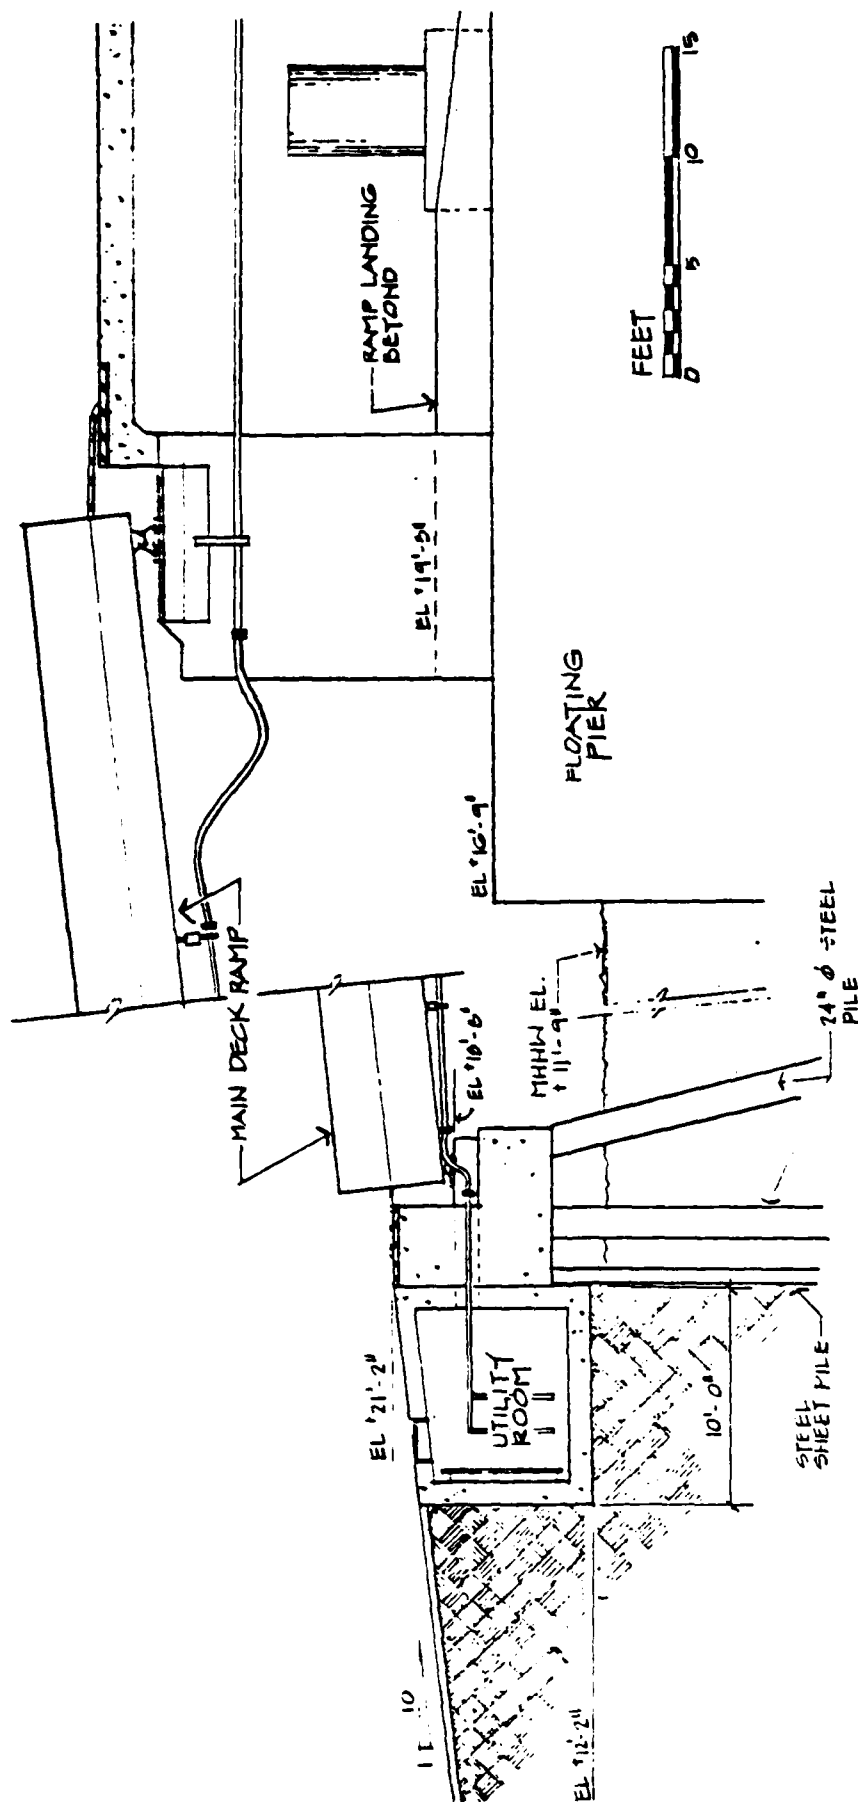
Electrical Connections at Ramp for a Floating Pier.
